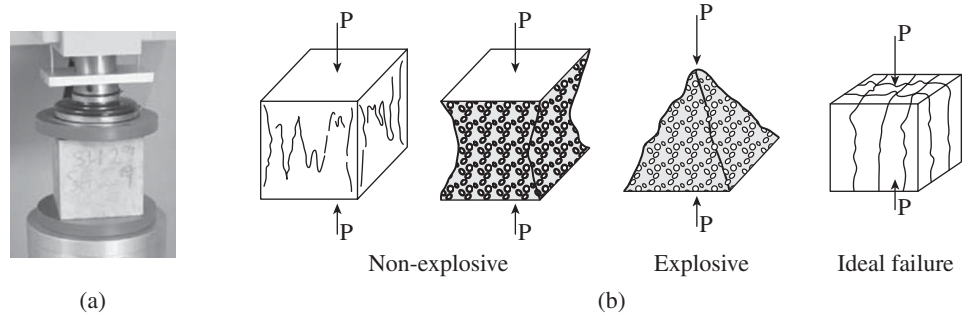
Cube testing and failure of concrete cubes (a) Cubes in testing machine (b) Failure of concrete cubes
